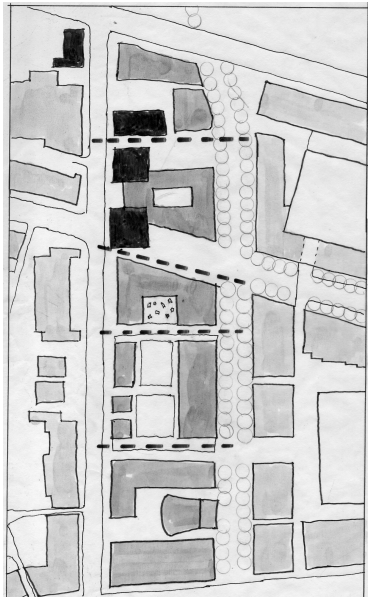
Plan Parti. Black indicates existing buildings on site. Light gray indicates context buildings.
